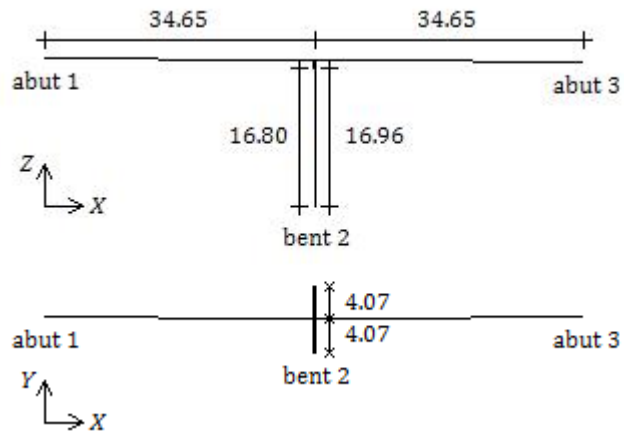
South Ingram Slough Bridge: Elevation and plan (Dimensions are in meters).
